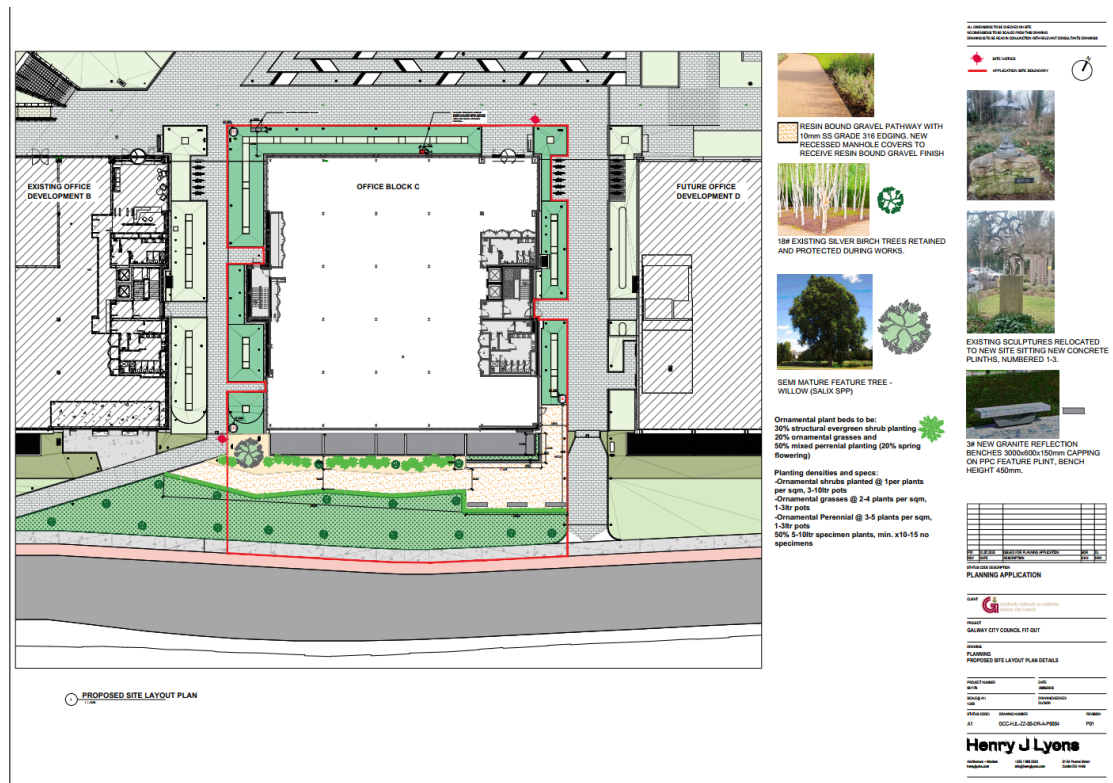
Site Plan with Area and Details of External Works Proposed Annotated. (Source: HJL Architects)
